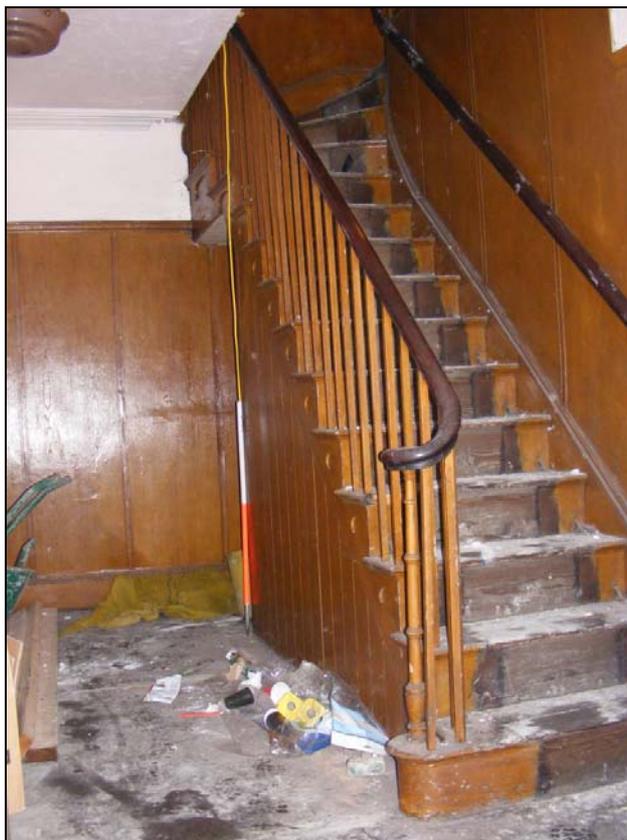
Staircase in hall between 46 King Street and 2 France Street
